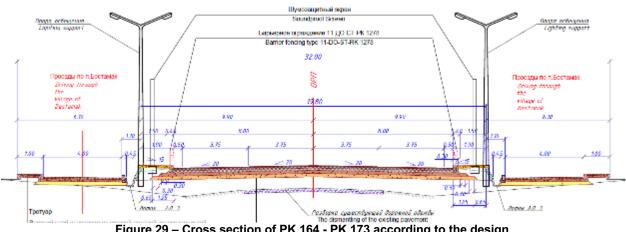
Cross section of PK 164 - PK 173 according to the design
